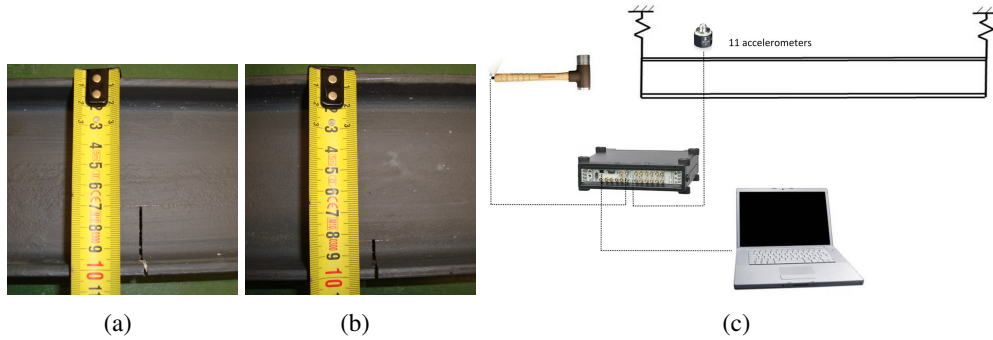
(a) 30mm and (b) 20mm depth induced saw cut damage for the steel I-beams. (c) Experimental set-up
